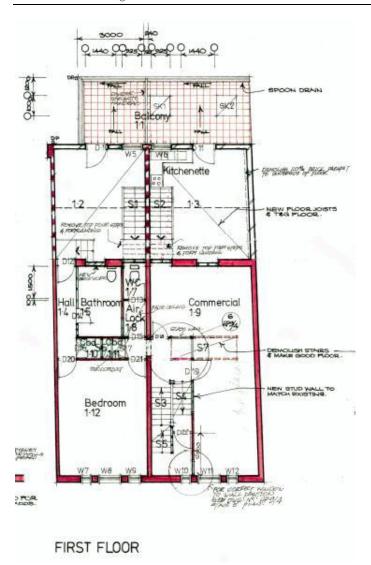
139–141 George Street, Proposed Renovations, Stage 1, January 1978, First Floor. The front room of 139 George Street was intended for commercial use and was reached via the stair from George Street. It connected to the dwelling on the first floor of 141 George Street via an opening in the party wall between 139 and 141 George Street. The rear room of 139 George Street (with kitchenette) was still reached via the existing stair from the rear of the shop below. Similarly, the rear room of 141 George Street was reached via the existing stair from ground floor level.
